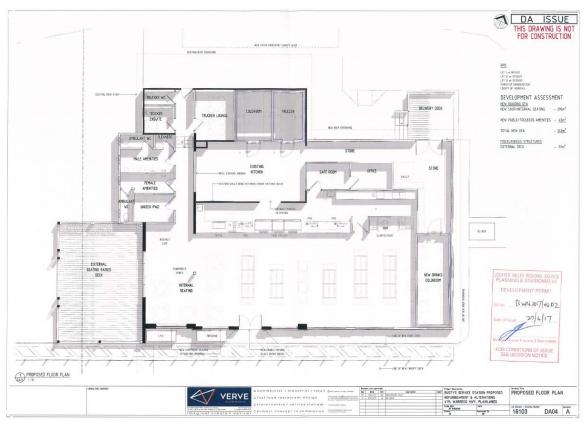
BWN2017/0002 approved internal floor layout plan.
